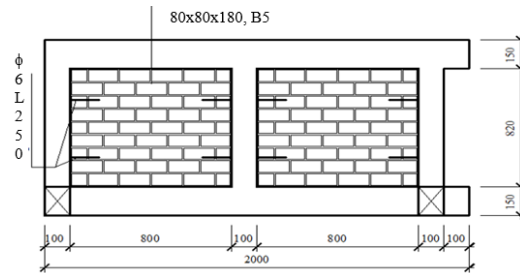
Frame K3–RC frame with infill wall of non-fired hollow bricks $80 \times 80 \times 180$ mm.
